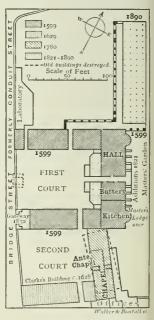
PLAN OF SIDNEY SUSSEX COLLEGE.
